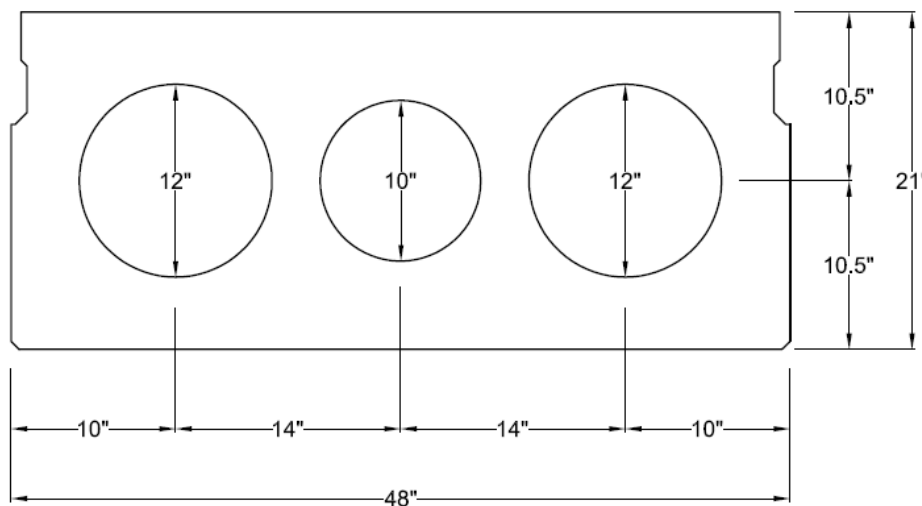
Dimensioned AASHTO voided slab type SIV-48
